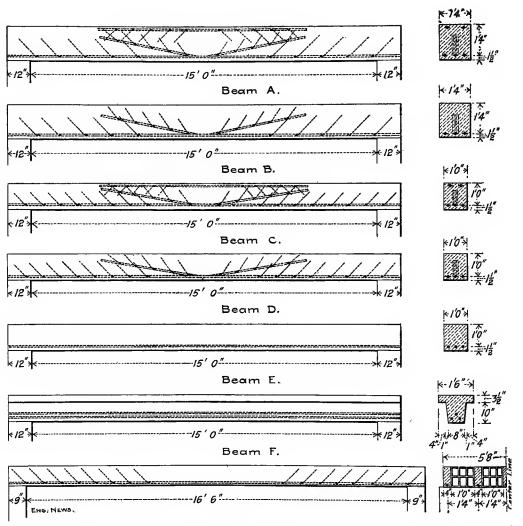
Diagrams of Test Beams and Floor Slab Showing Dimensions and Reinforcement.
